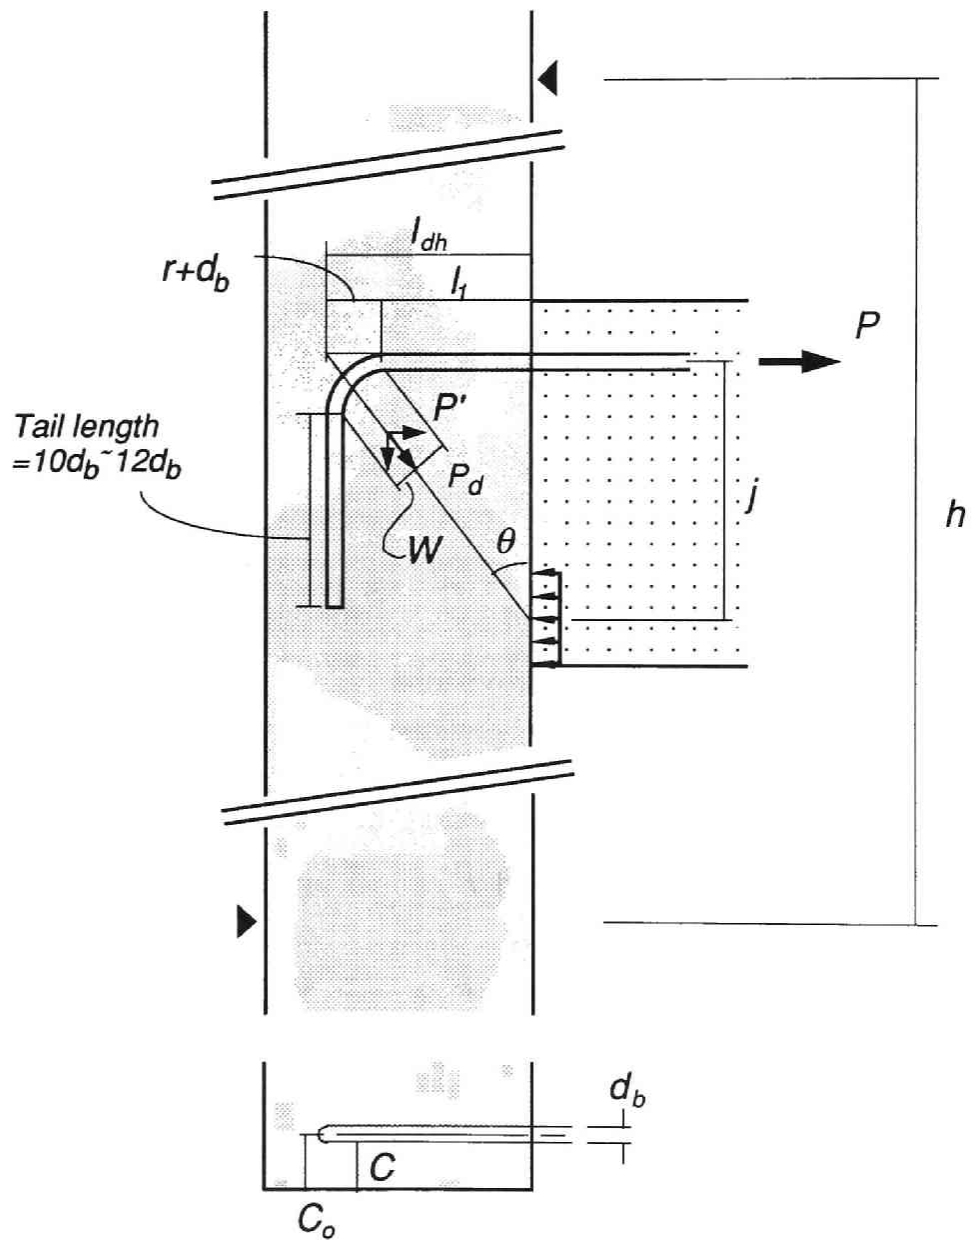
Anchorage strength of a reinforcing bar related to the bearing strength on concrete by Fujii et al. [4.13]
